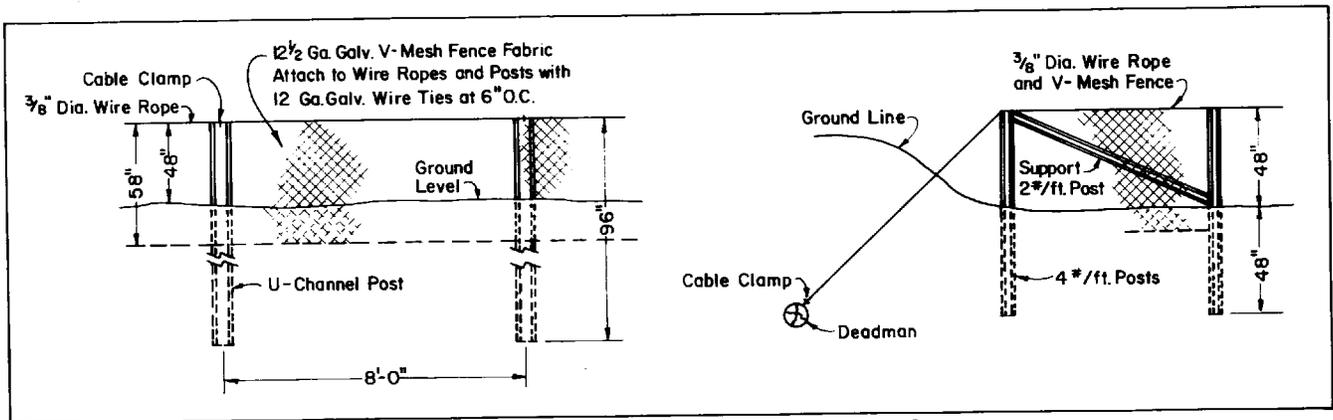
Details of main revetment and baffle sections and the deadman and support assembly.
